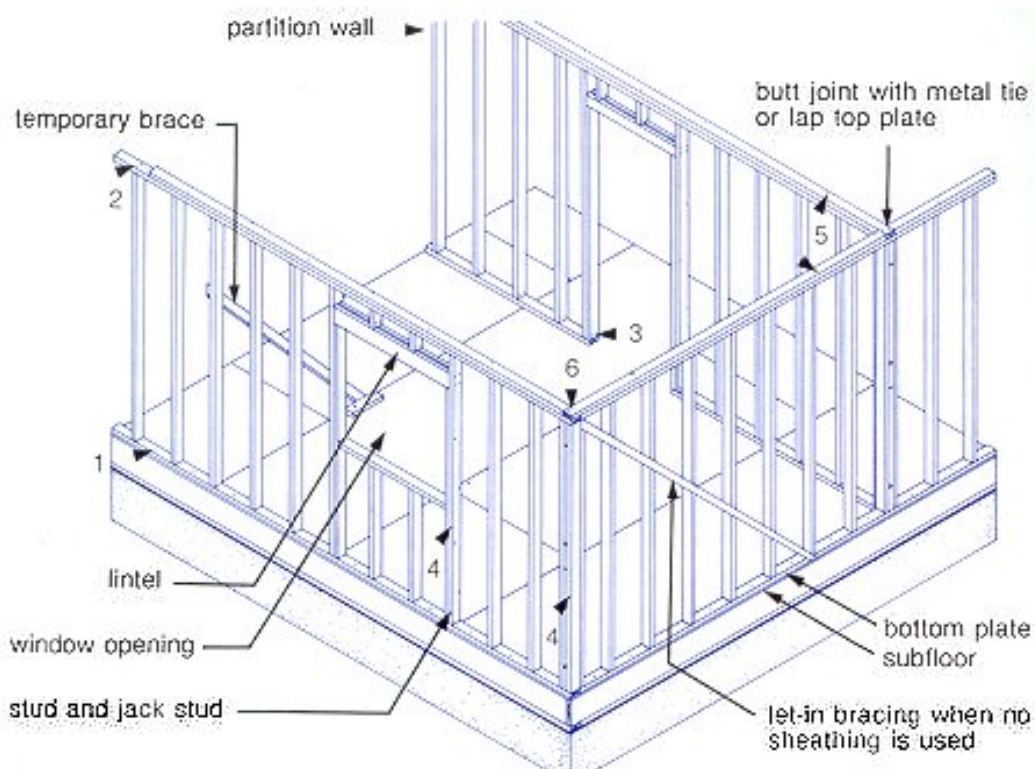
Typical Wood Frame Walls for Residential Construction (CMHC, 1989)
